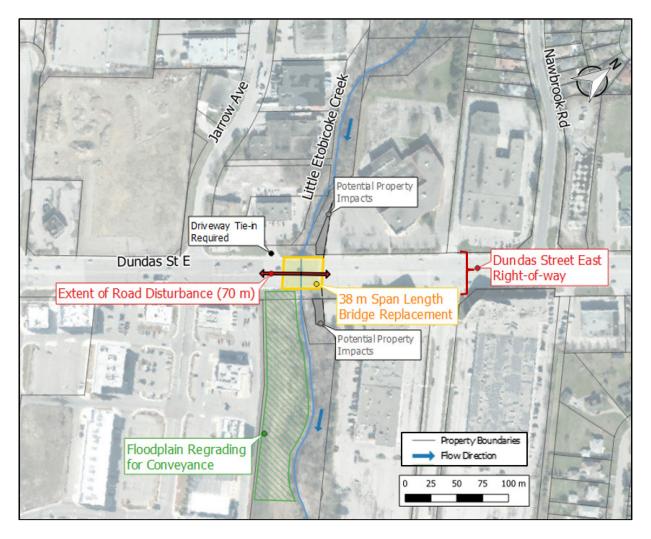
Dundas Area Alternative Solution 3: 38 m Span Bridge with Downstream Floodplain Conveyance Improvements
